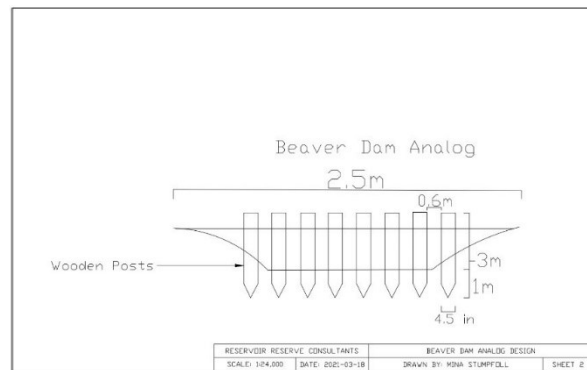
AutoCAD design of the proposed Beaver Dam Analog structure.
